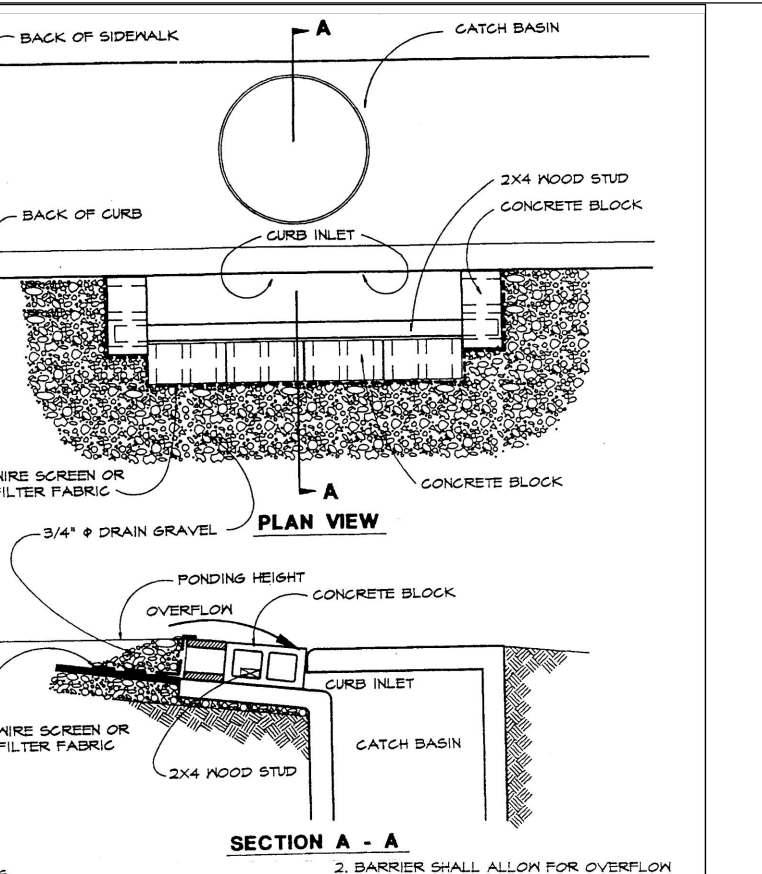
Block and Gravel Curb Inlet Sediment Barrier
